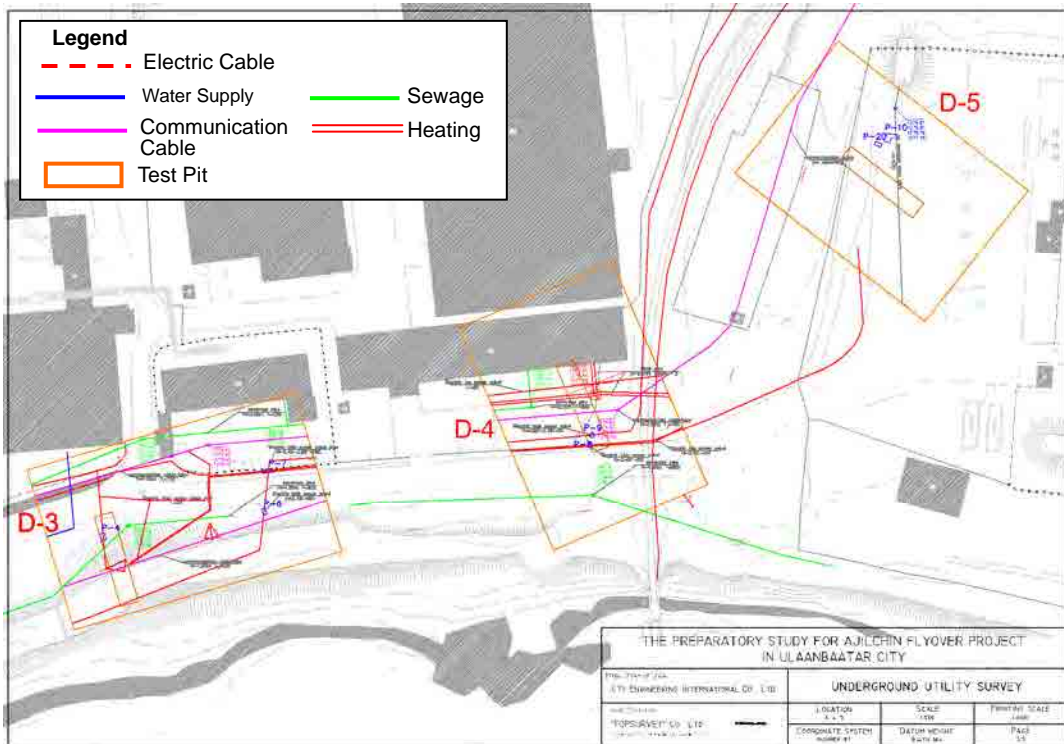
(3) Detailed Figure of Test Trench Location (D-3 to D-5)
